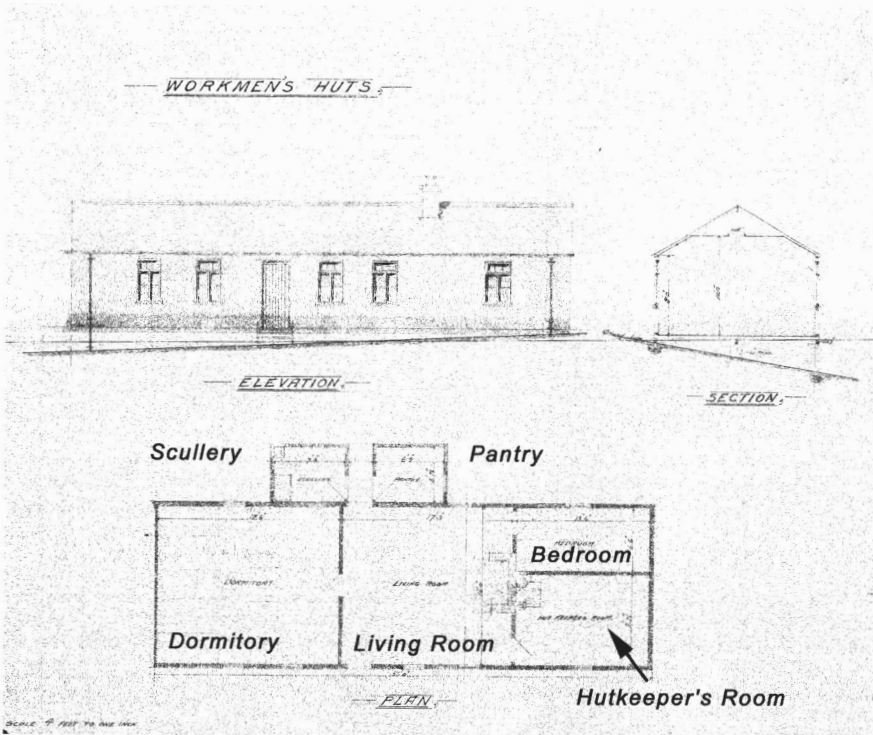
Plan and elevations of navy dormitory, Tin Town. From DVWB n.d.
